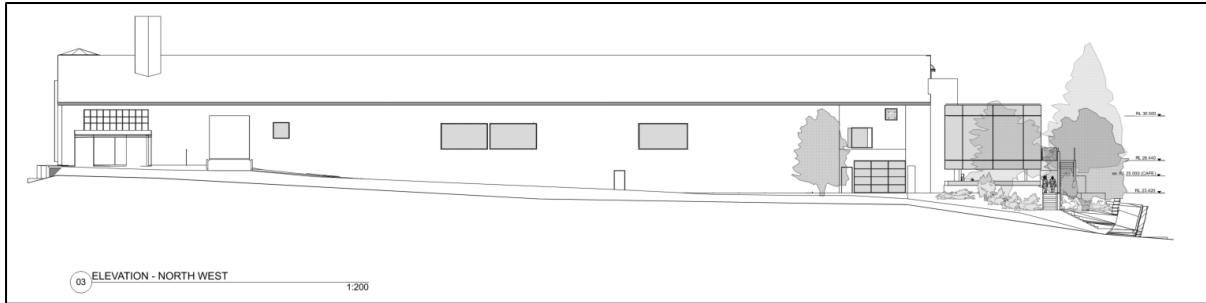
Building 14 Northwest Elevation. Source: Maitland City Council dated 20/06/2023
